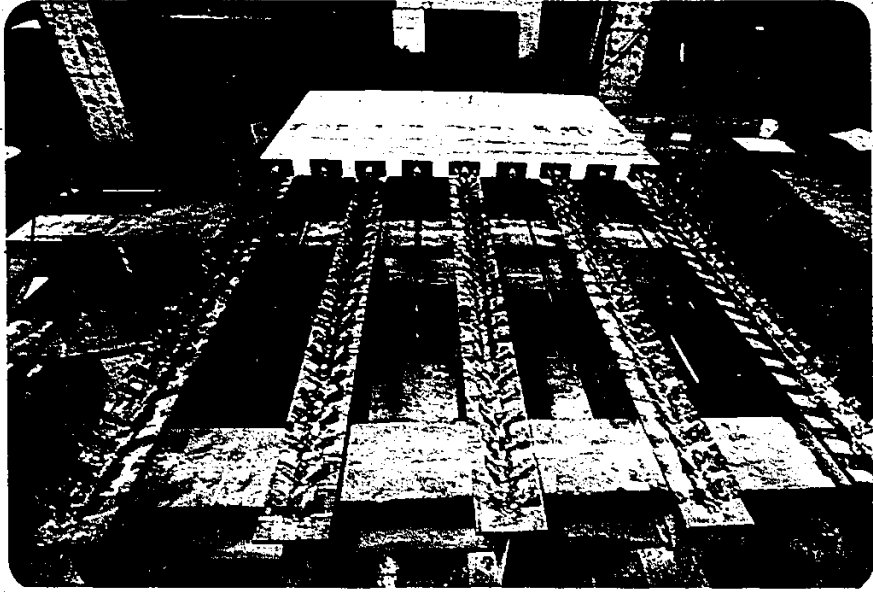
A VIEW OF PRESTRESSED SLAB PORTION
